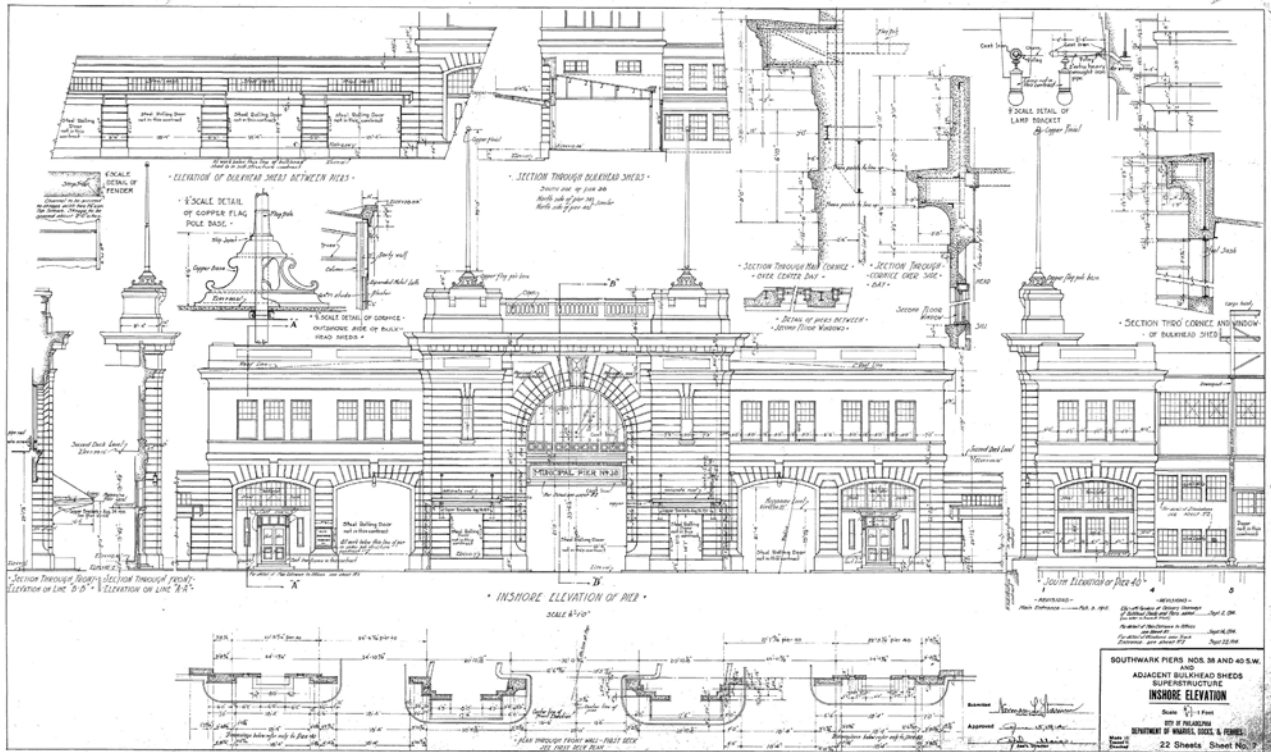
Original elevation drawings and details for Pier 38, made by the Department of Wharves in 1914.
